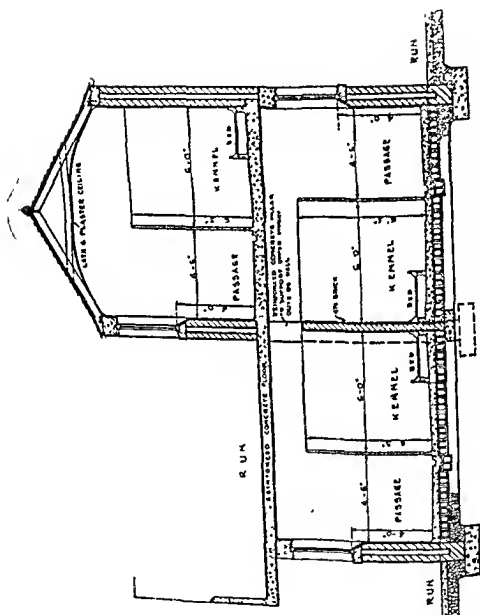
Section of a double-story building with kennels placed back to back on the ground floor.
